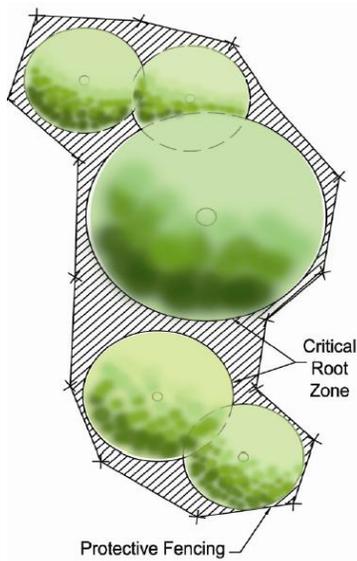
Protective fencing should be place at the outer limits of the tree protection/critical root zone.
